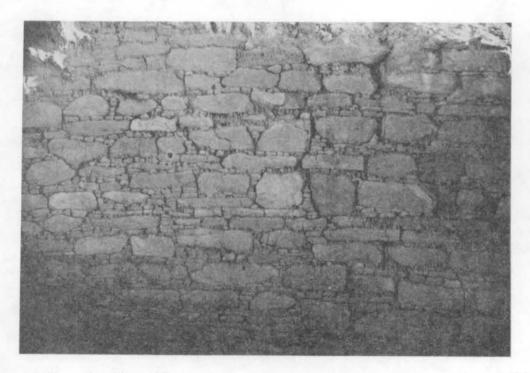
Sterling Chacoan structure. Chacoan masonry in partially excavated large kiva.
